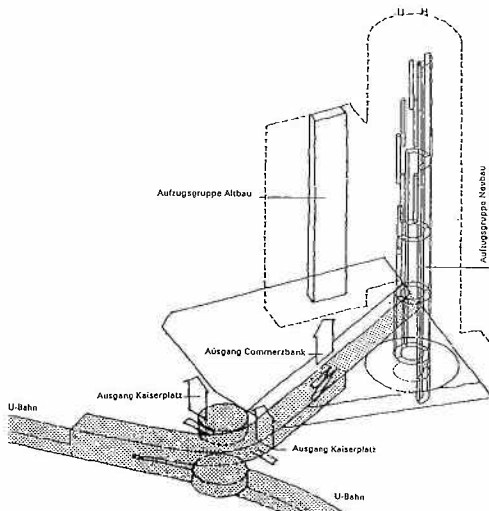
Link to U-Bahn and car parking at lowest level from shopping gallery on ground floor of tower
